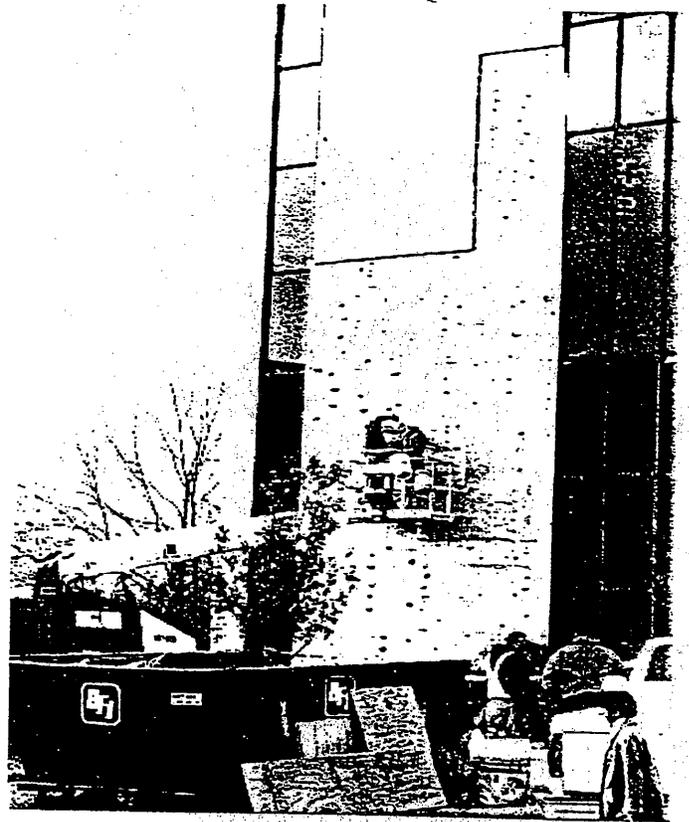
The panels were replaced over a new plywood substrate by Felmley-Dickerson Company.
